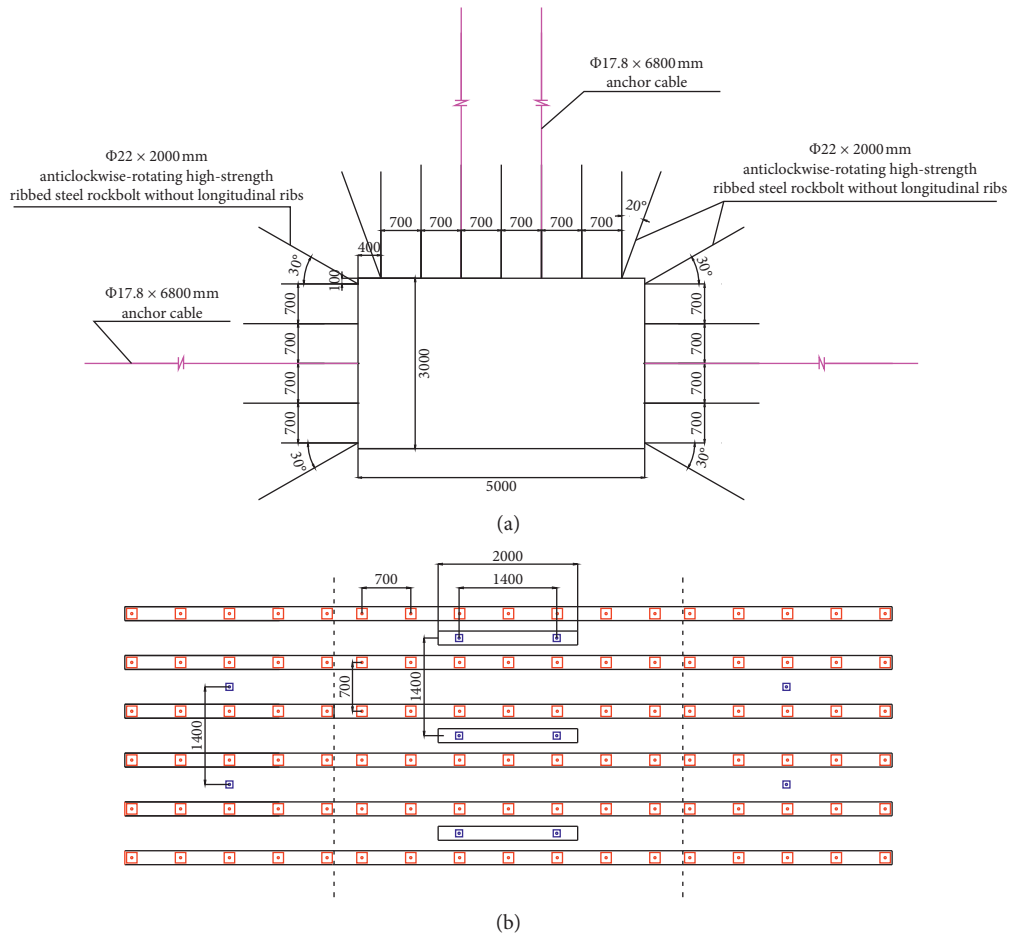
Roadway-support plan. (a) Cross section of support (unit: mm). (b) Expanded view of support (unit: mm).
